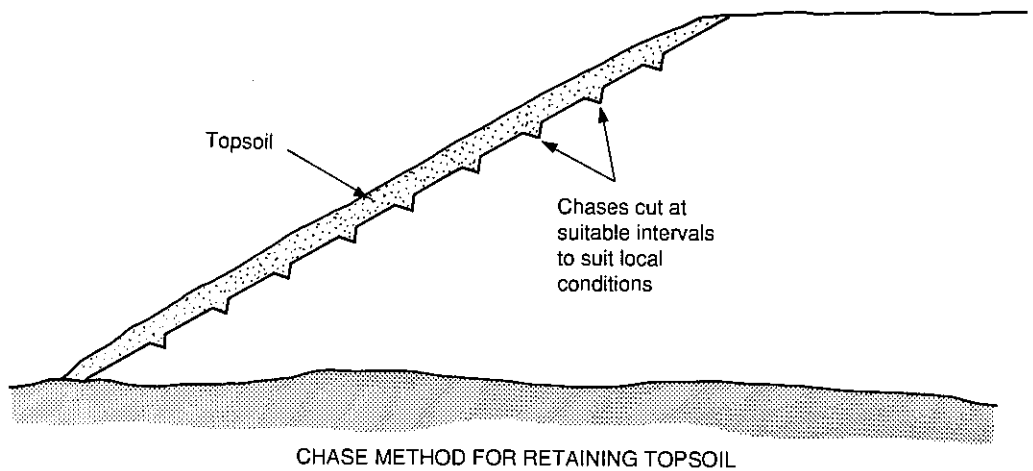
Methods of retaining topsoil on the slopes of embankments and cuttings (CSIR, Technical Recommendations for Highways, TRH9).
